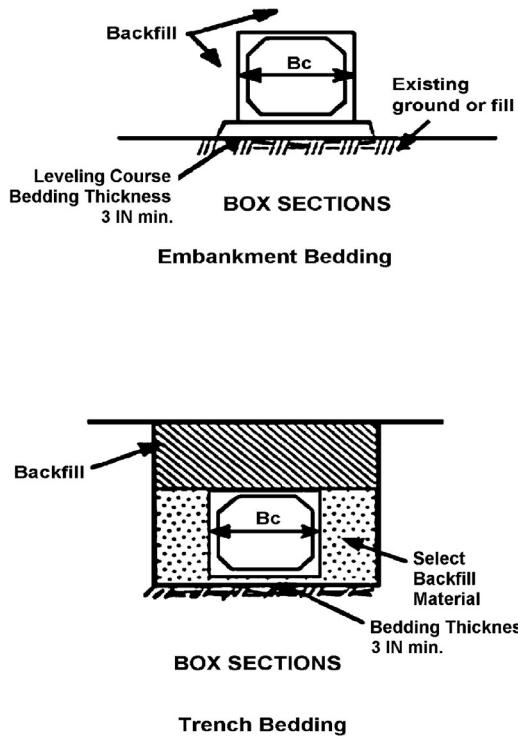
Bedding and Backfill Requirements.
